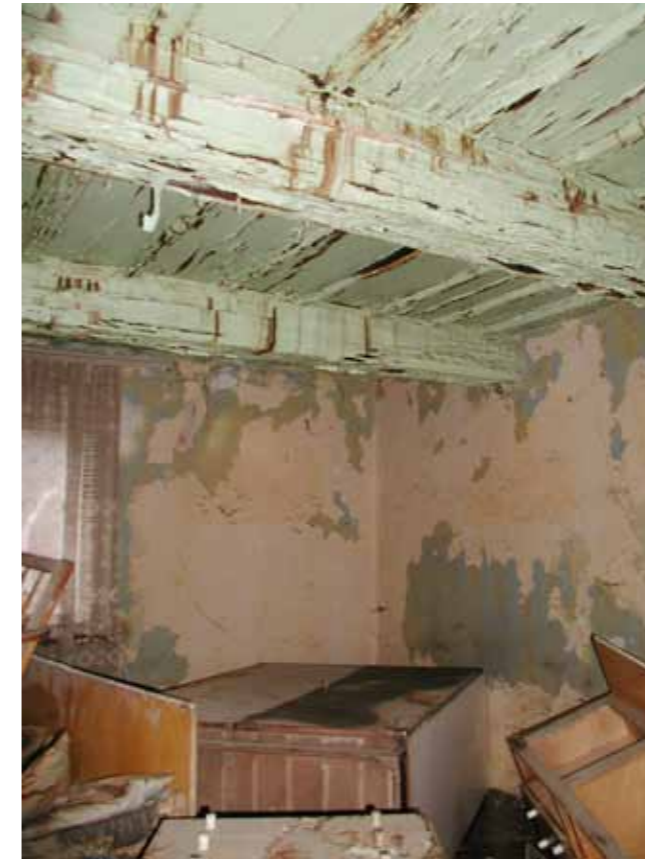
The wet and deformed timber joist needed to be dried after removal of all lime wash paints and mortar fillings. Source: M. Drdäcký
